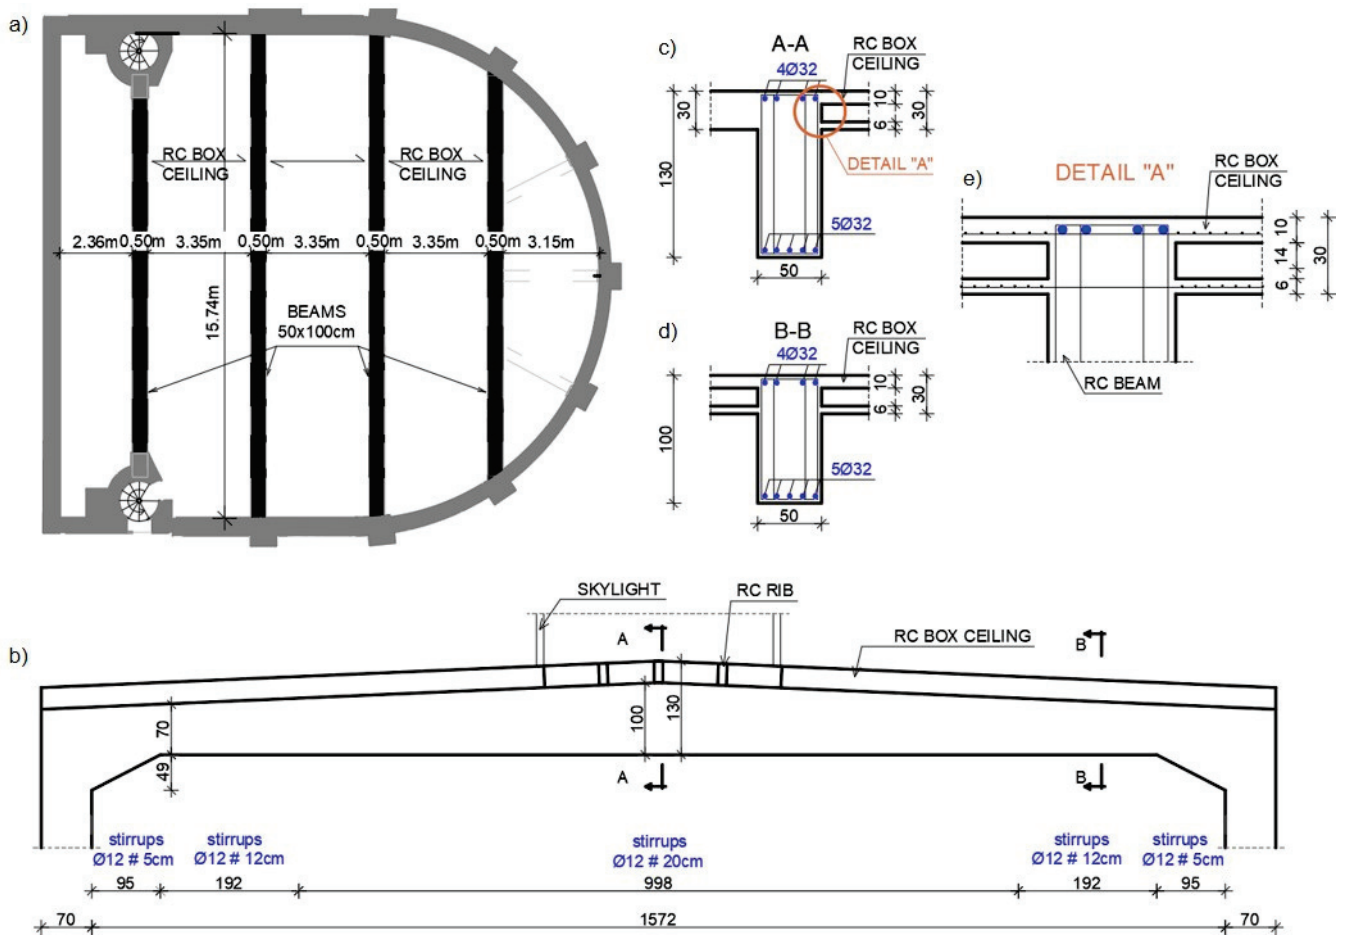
The layout of the roof ceiling: (a) plan of the beams; (b) view of the beam; (c,d) structural cross-sections of the beam; (e) layout of the box ceiling.
